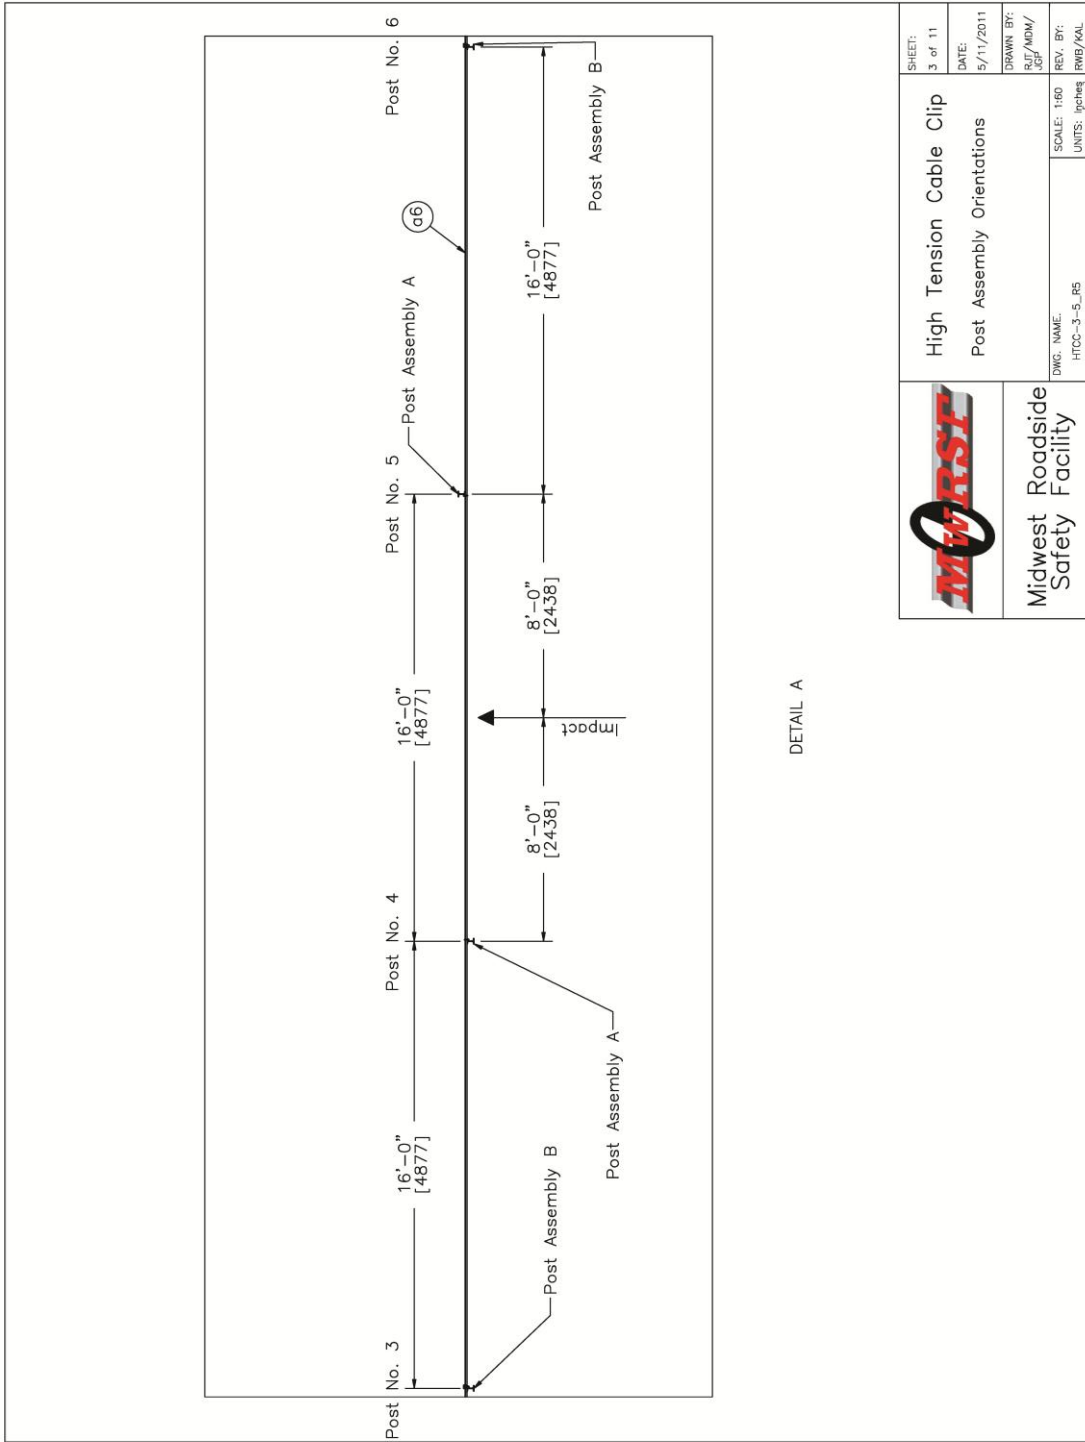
Testing Details, Test Nos. HTCC-4 and HTCC-5
